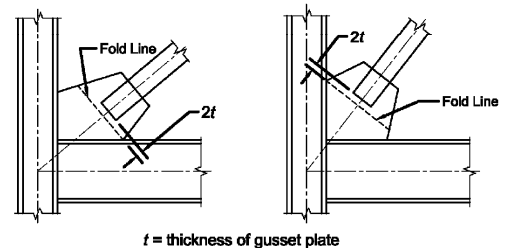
Brace-to-gusset plate requirement for buckling out-of-plane bracing system.
